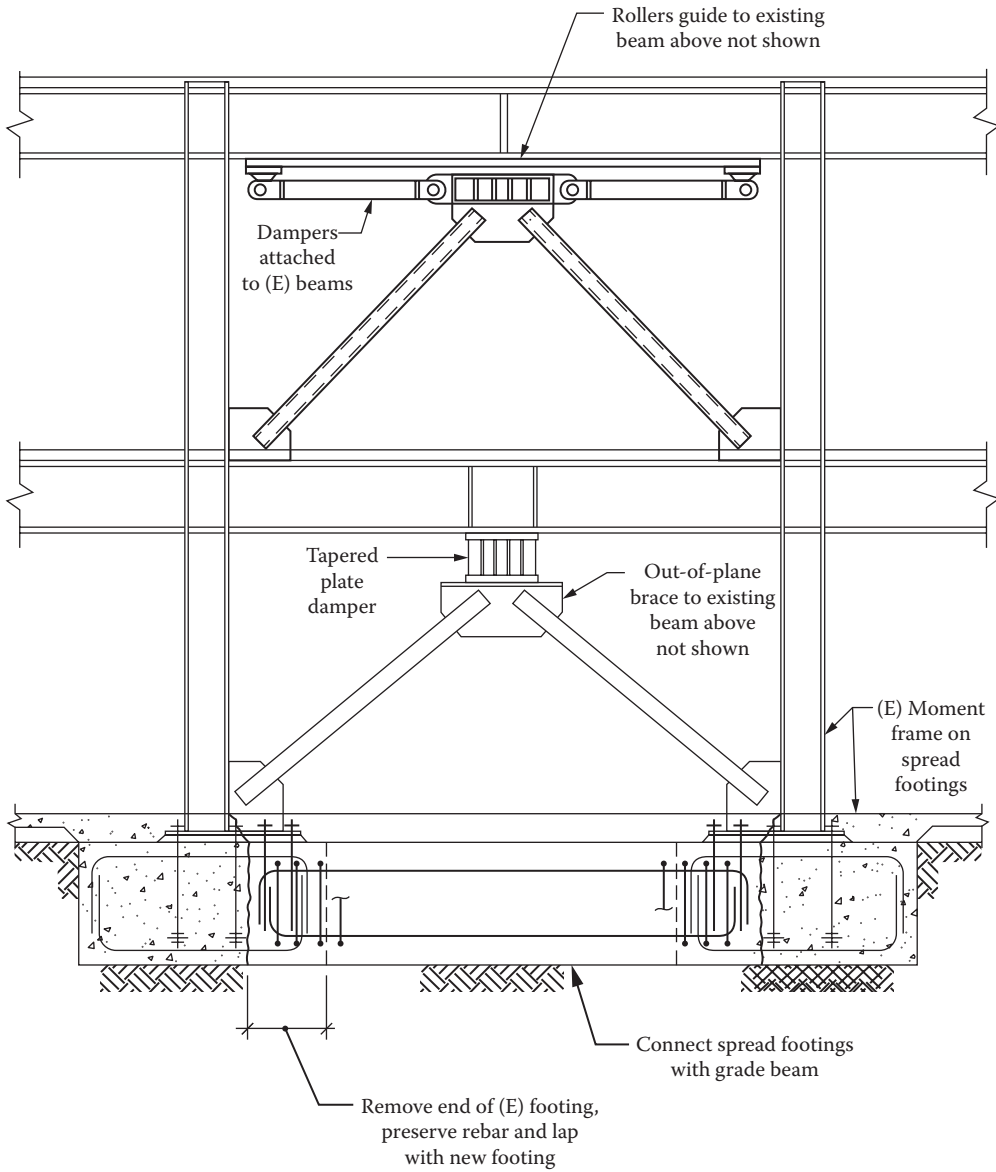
Additional damper alternatives for rehabilitating an existing moment frame.
